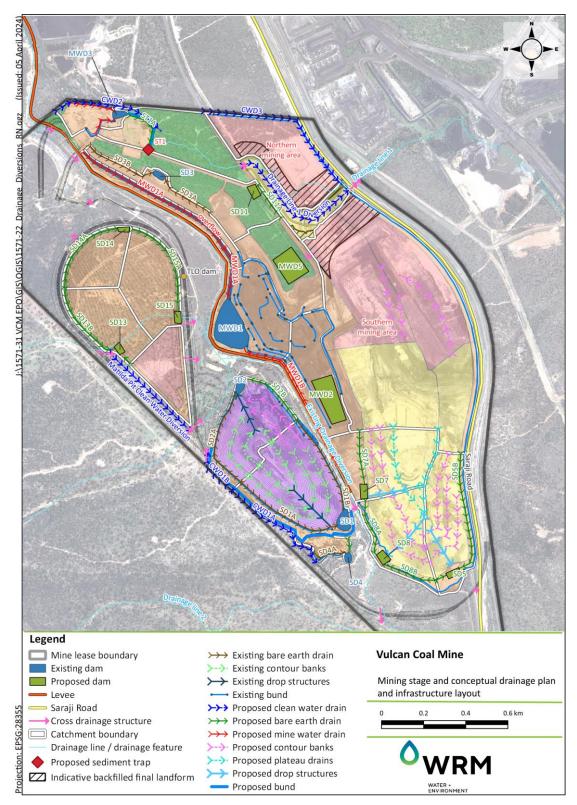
Mine pit conceptual drainage plan and infrastructure layout
